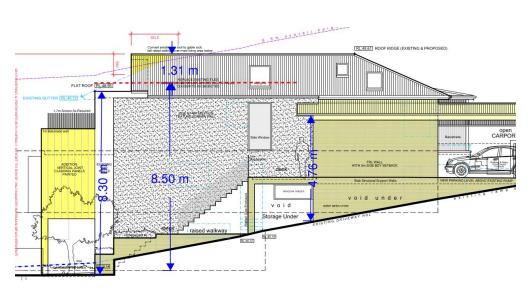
southern elevation and minor extent (610mm) of the proposed building height exception
